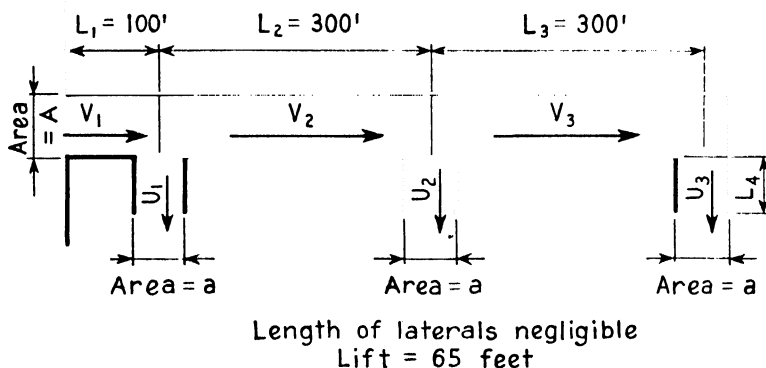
Elementary filling system. Longitudinal conduit with short laterals.
